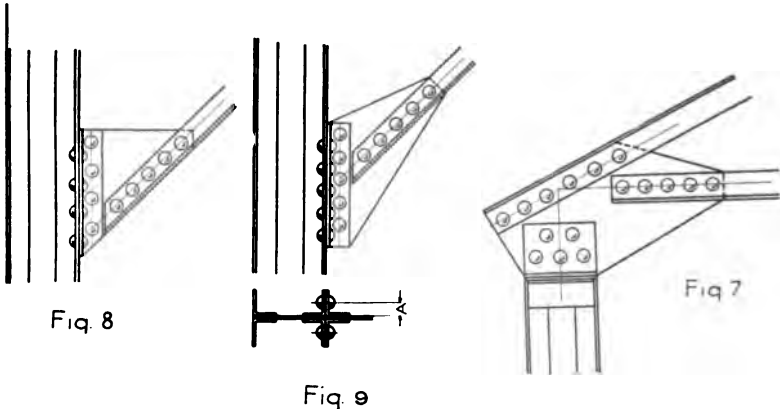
shows the detail of a knee brace connection to a column, which is not uncommon in mill building construction. This detail is open to the same criticism as the other eccentric connections already discussed. It is especially to be condemned in view of the fact that the knee brace is subject to tension, as well as compression, and when the knee brace is in tension, the entire stress must be resisted by two rivet heads. Fig. 9 shows the proper detail for this connection. The gauge,  $A$ , for the rivets connecting the knee to the column flange should be as small as possible, and the thickness of the con-
